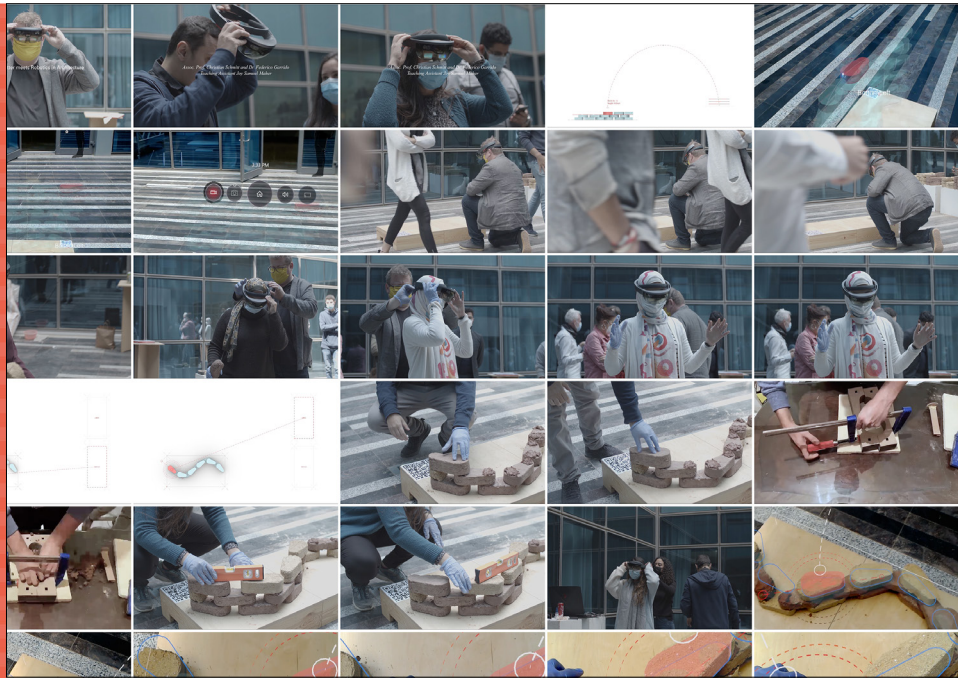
Assembly Process (<https://vimeo.com/714403348>)
